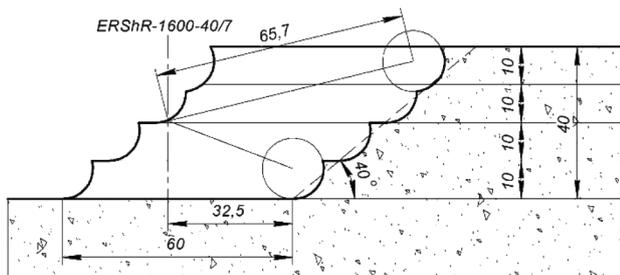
Mine face profile of the excavator ERS_hR-1600-40/7 when working out the overburden bench with a height of 40 m
